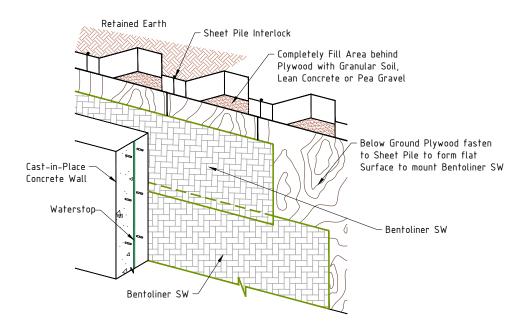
Install BentoLiner® SW onto steel sheet piling retaining wall with washer-head fasteners
